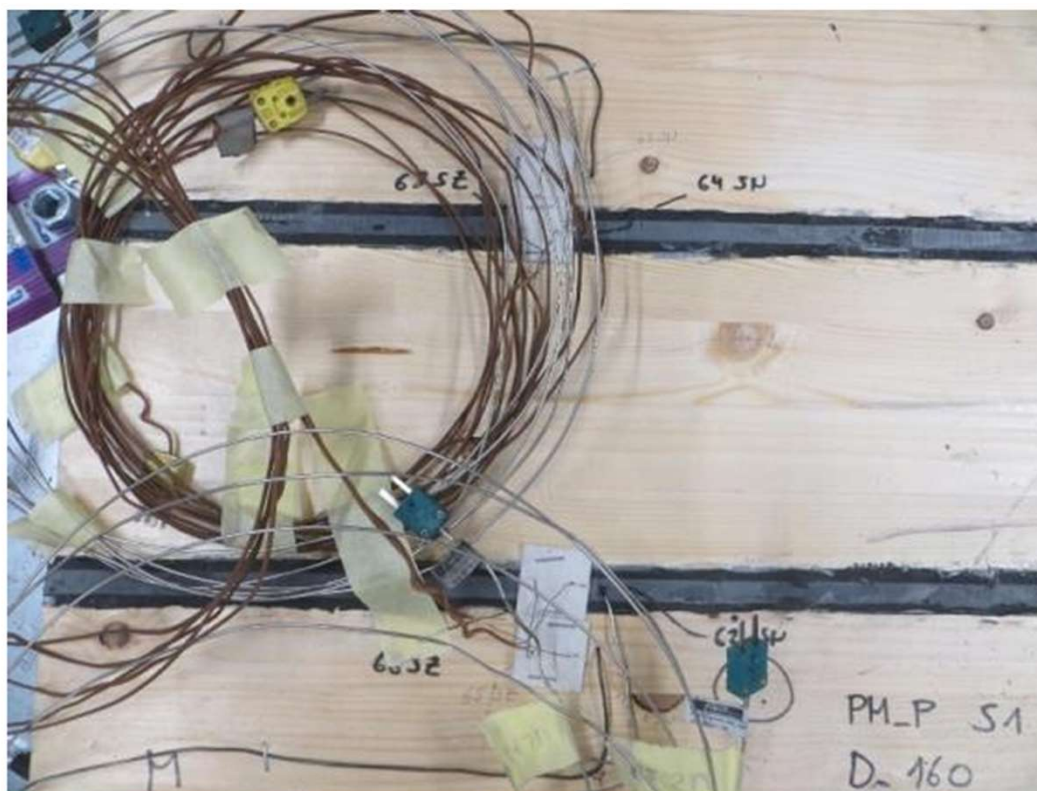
Thermocouple placement in specimen no. 7 (*photo archive 049506d-141*)
